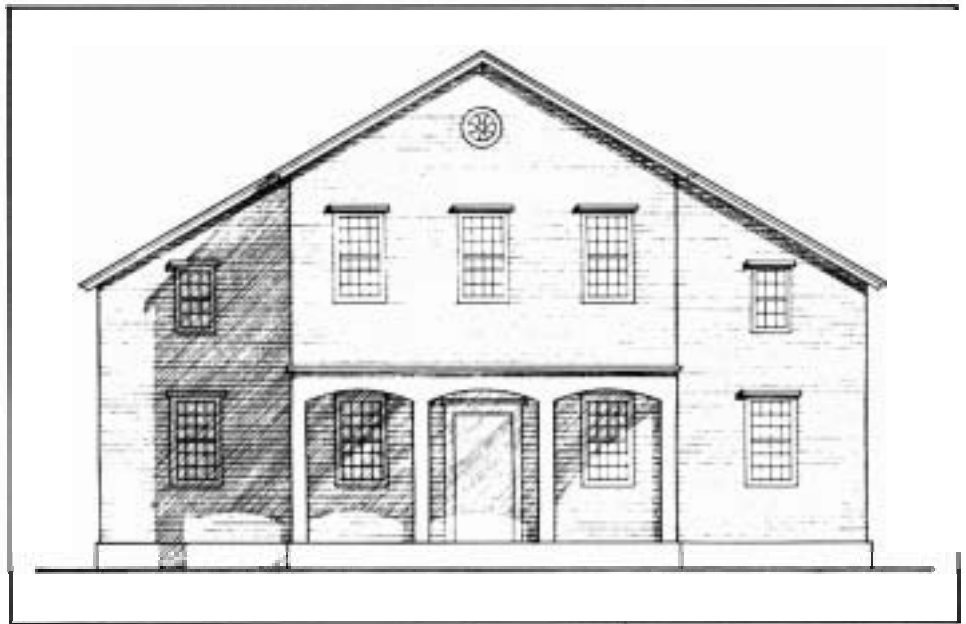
Reconstructed elevation of the west facade of the house. (Drawing by author)
